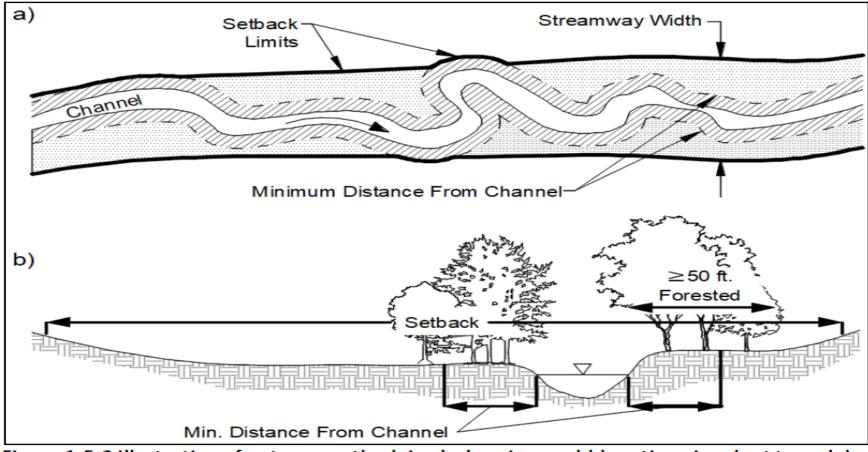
Illustration of a stream setback in a) plan view and b) section view (not to scale).
